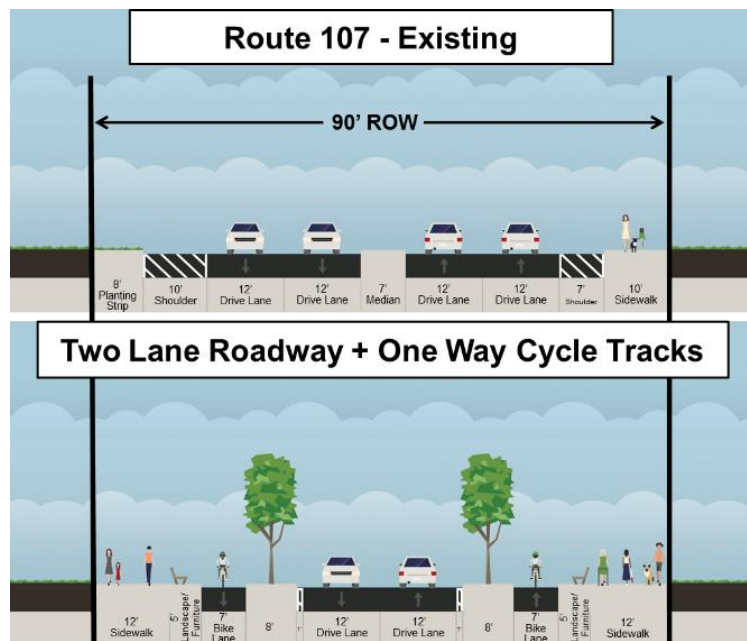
Potential Cross-Section – Two Lane Roadway + One Way Cycle Tracks
